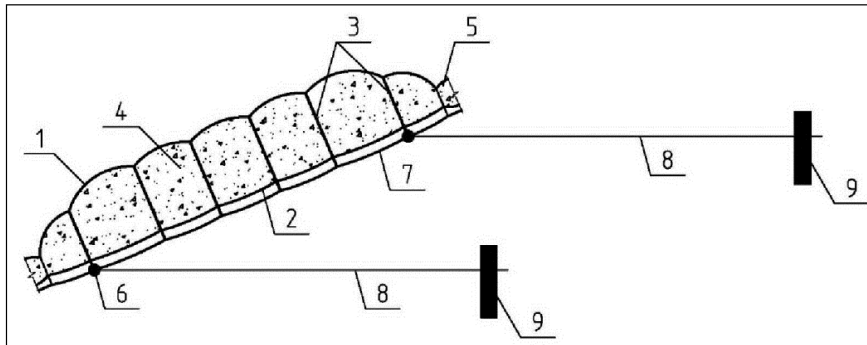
Improved construction of concrete filling textile mats: cross section, profile drawing.
